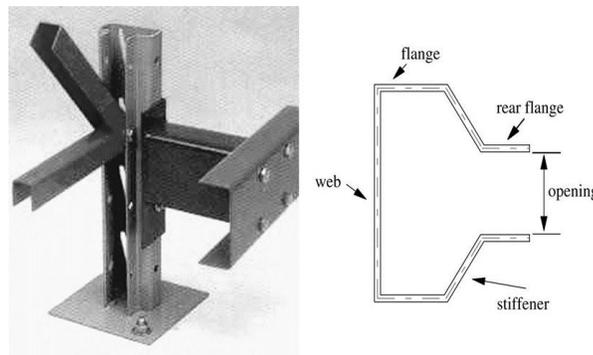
Connections in the column, “Rack” cross-section type and nomenclature.
